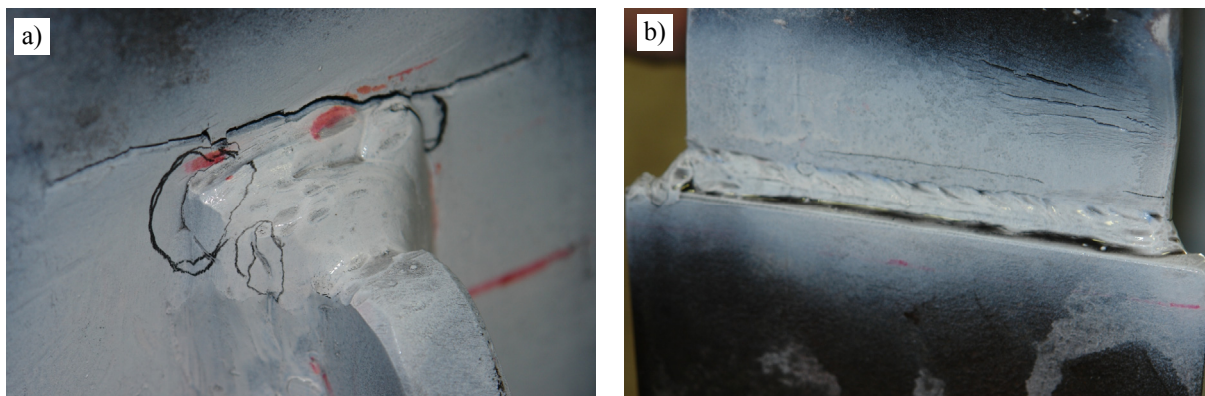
a) Cracks at the end of the rib-stiffener fillet weld in specimen RS2.3, b) Practically undamaged transverse fillet weld, including its HAZ region, at the end of the cover plate in specimen CP1.4
